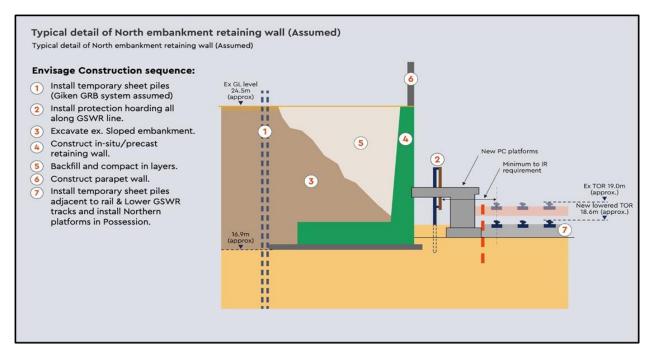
Typical North Embankment Retaining Wall Detail (Assumed)
